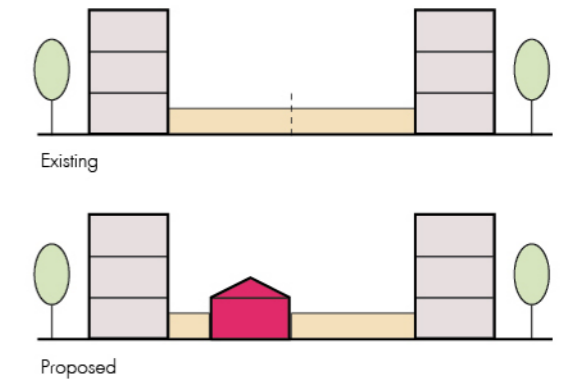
Section diagram illustrating street facing garden site with proposals subservient in scale and roof form to the host building plot and neighbouring property.
